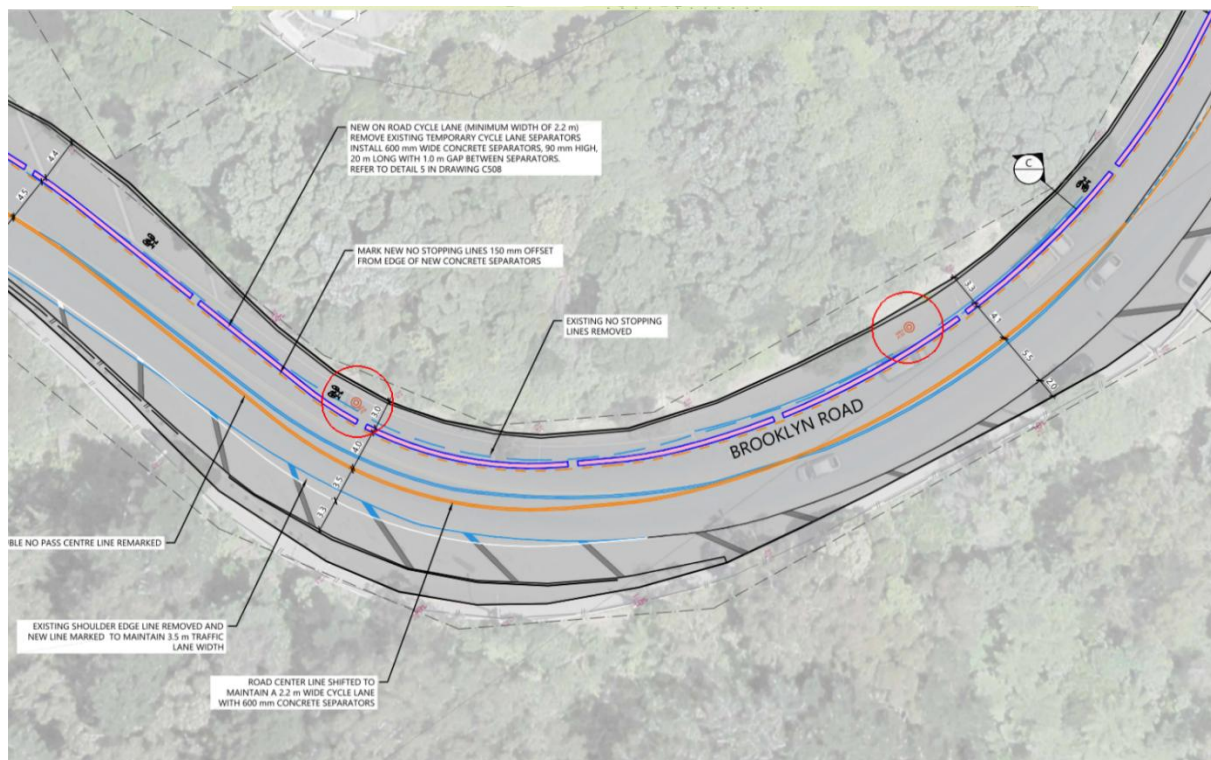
Drawing Sheet C306 - Multiple Manholes on Cycle Way
